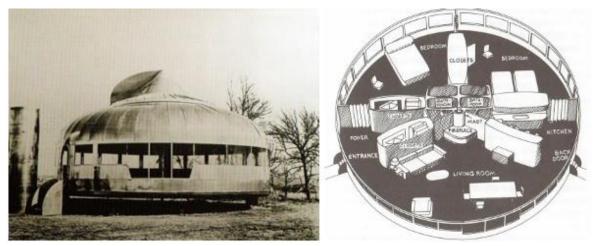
Left: The View of the Constructed Dymaxion House, Right: The Plan of Dymaxion House (Altın, 2013).
